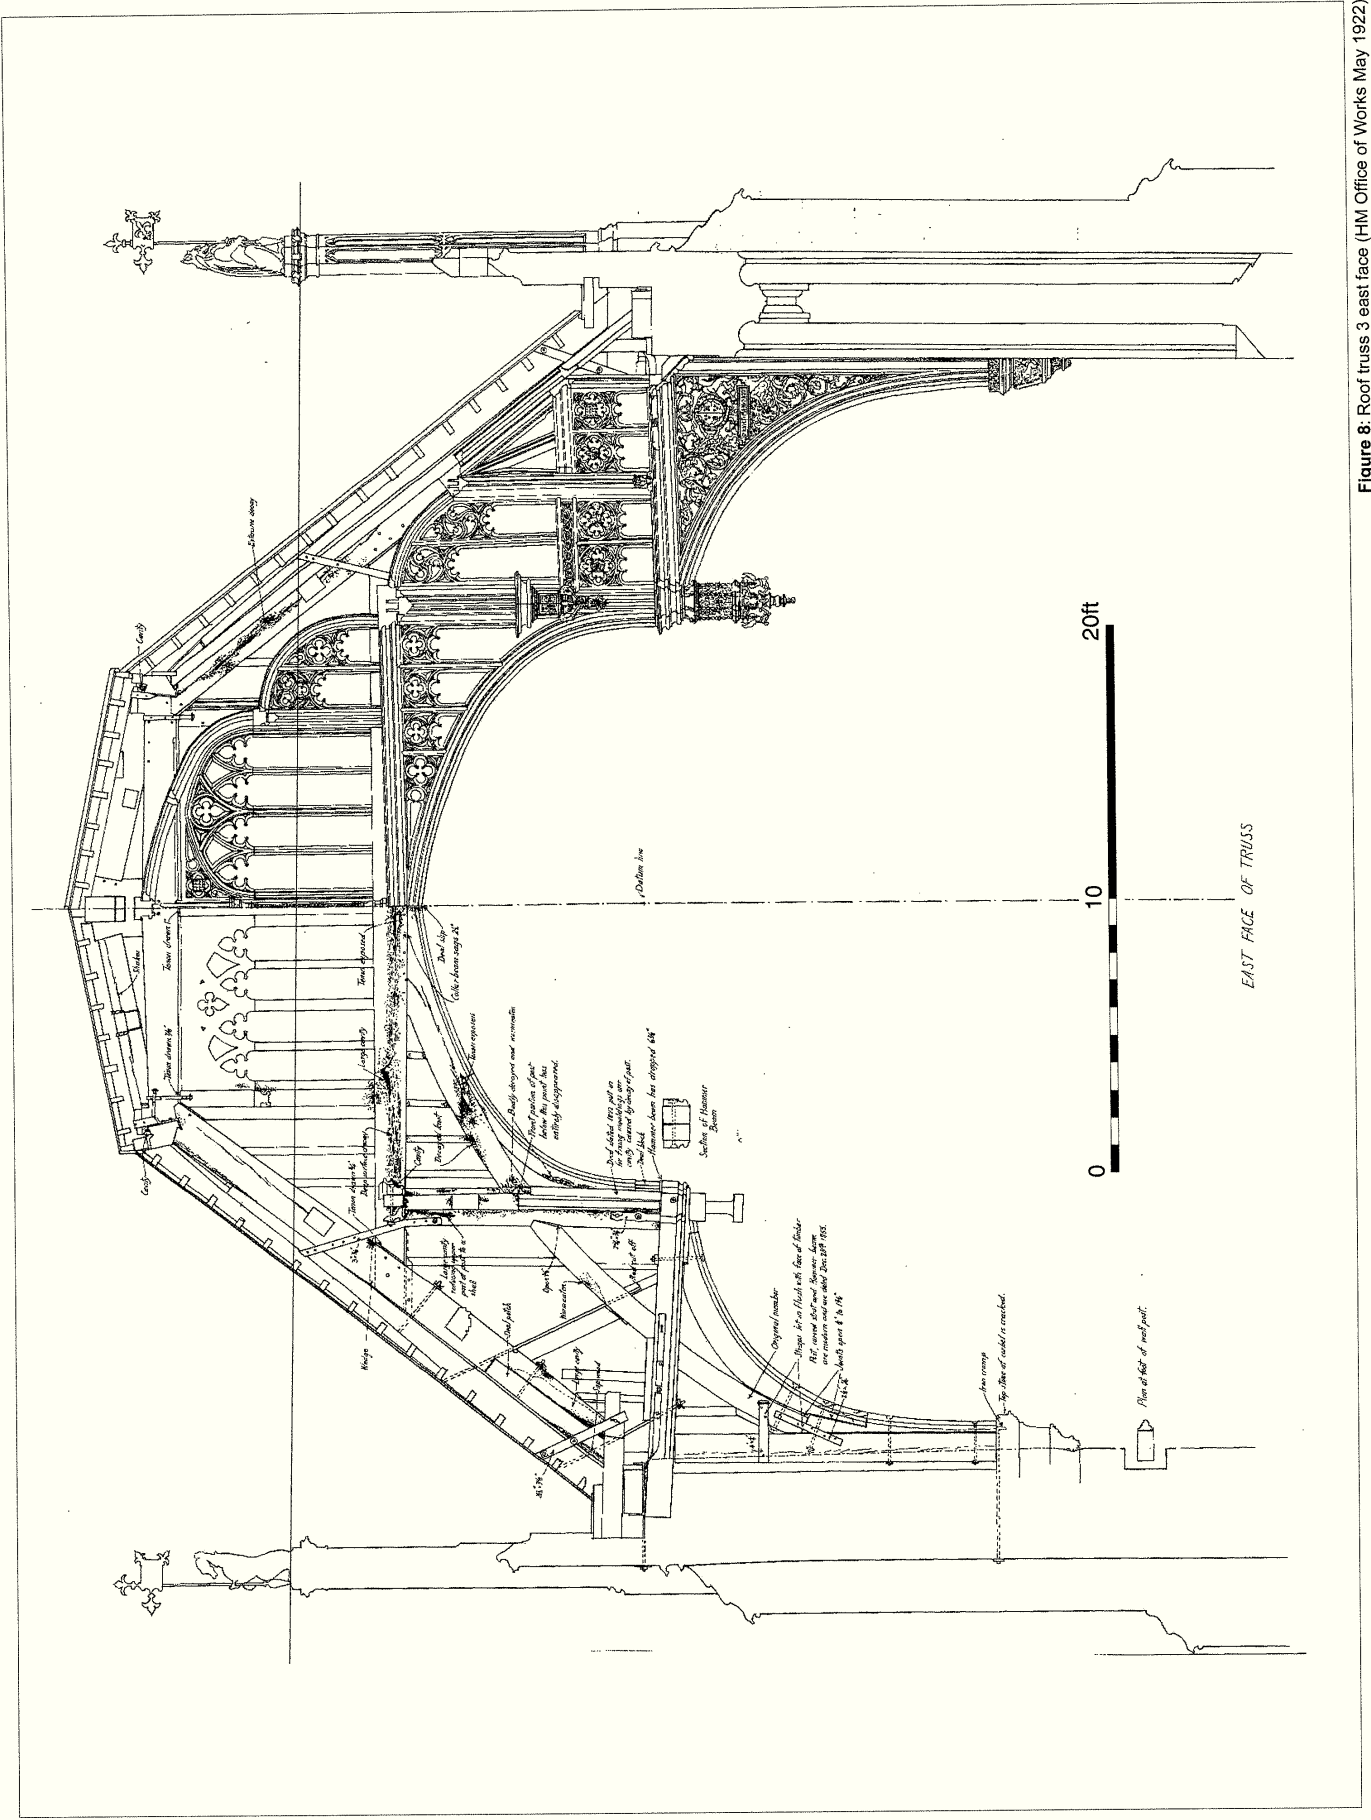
Roof truss 3 east face (HM Office of Works May 1922)
